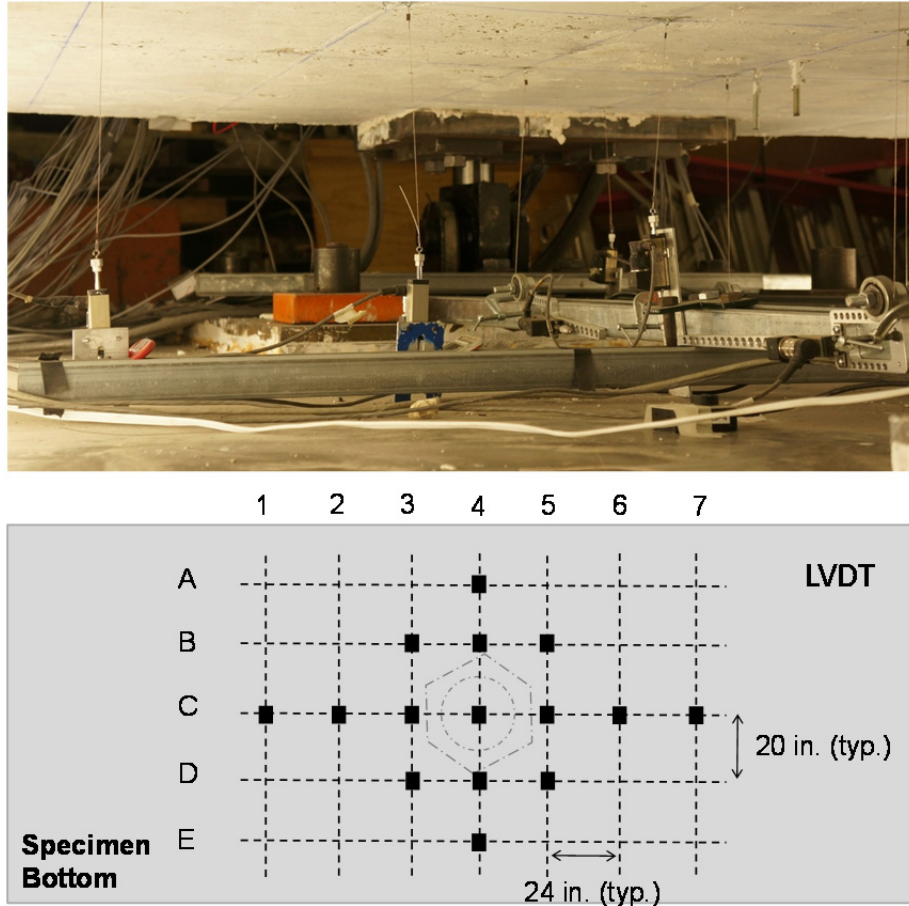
LVDTs under the specimen monitoring the deformation of the cap beam and the box-girder.
